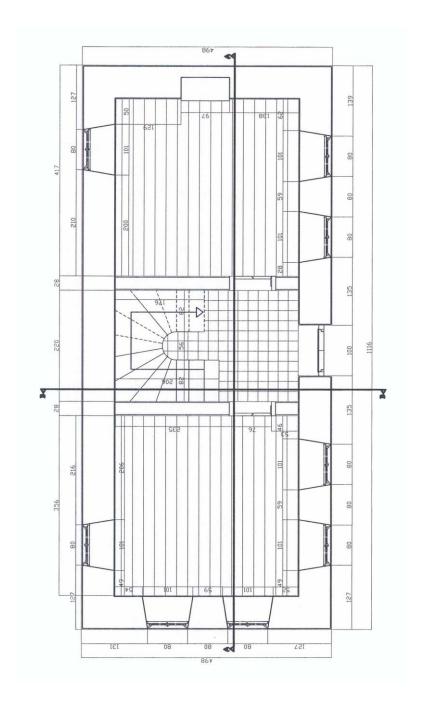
Ground Floor Plan of 1-Artemis Street Scale: 1/75
